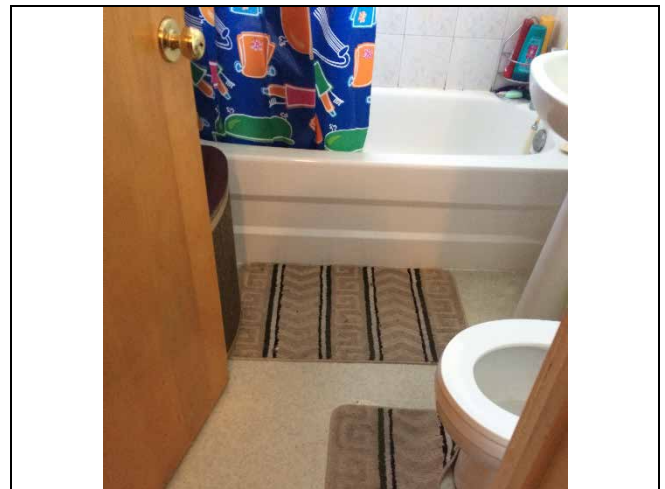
Presumed asbestos-containing ceramic tile grout and mortar / adhesive in the washroom wall at 84 Brighton.
